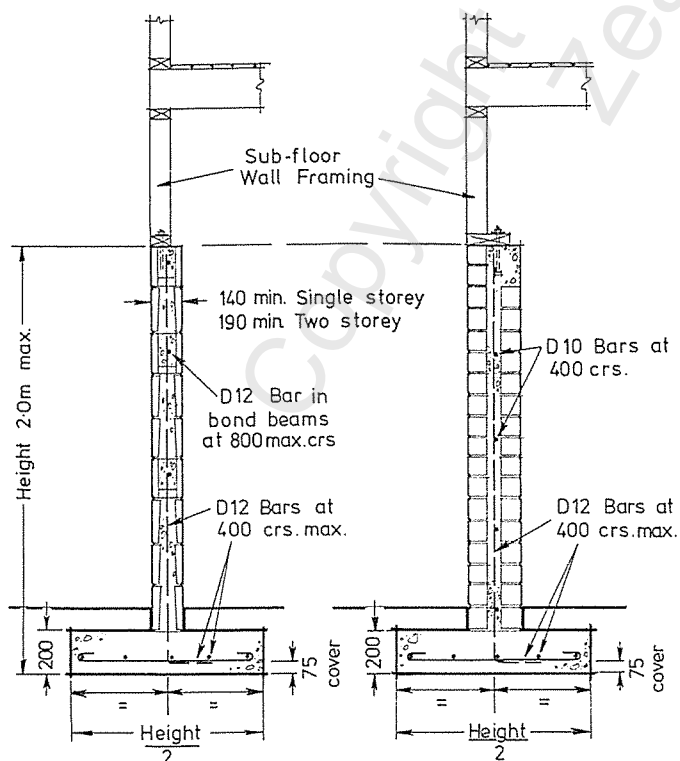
Continuous single-wythe clay masonry foundation walls
